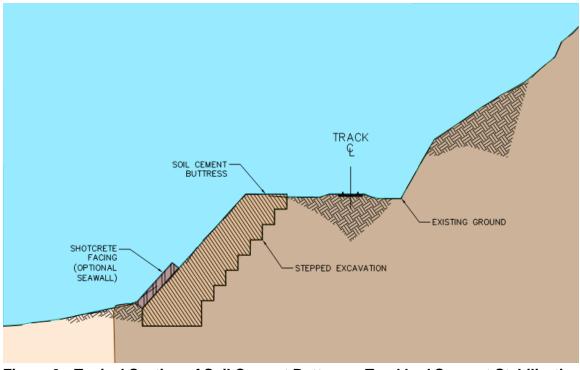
Typical Section of Soil Cement Buttress - Trackbed Support Stabilization Areas
